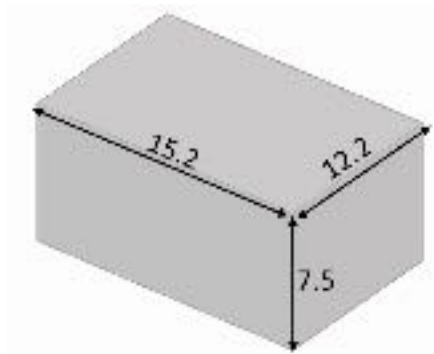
1: Parent two-story building (full-scale dimensions in m)
